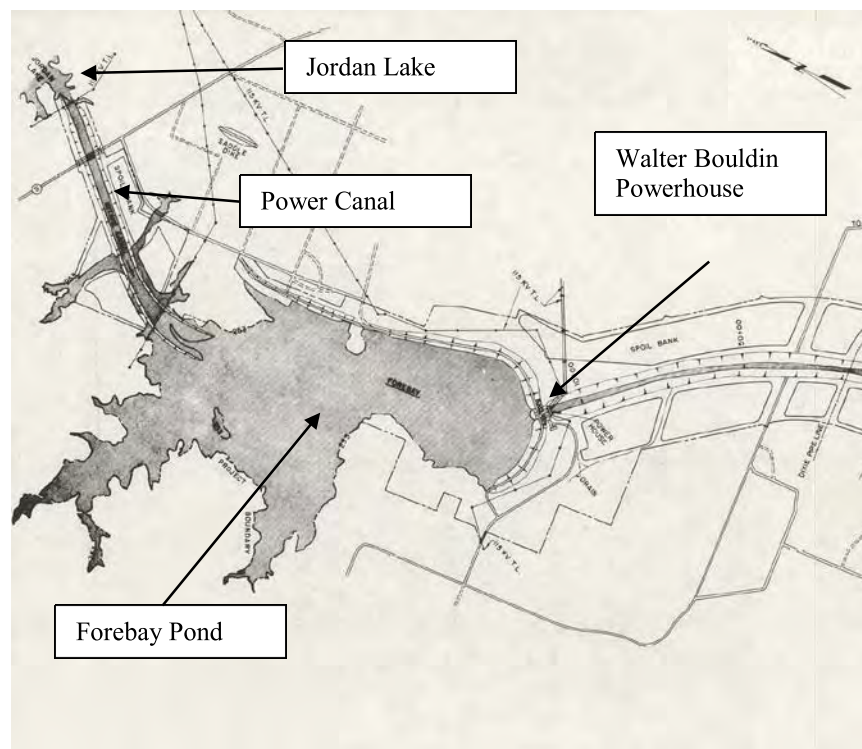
Walter Bouldin forebay pond, powerhouse, and power canal from Jordan Lake (modified from FERC 1978).
